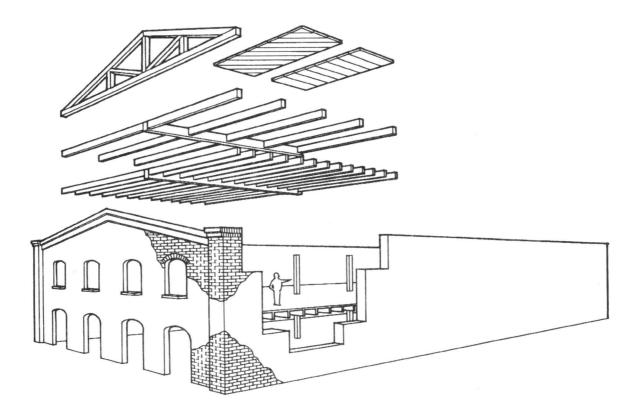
Typical unreinforced masonry bearing wall building (URM). From Lagorio and others (1986).
